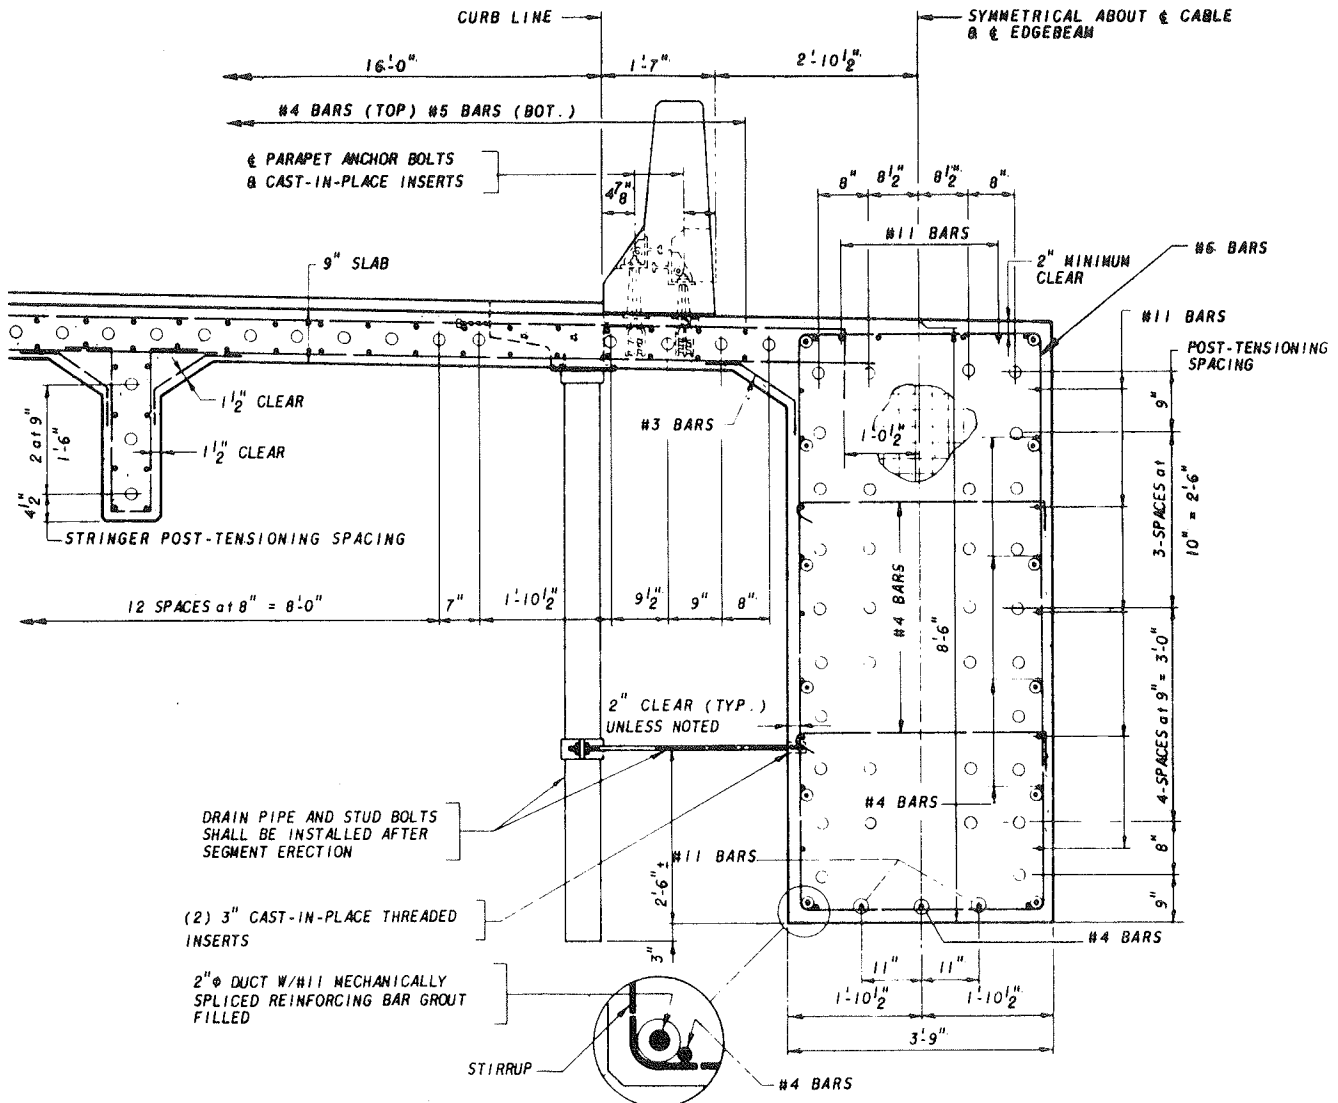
Concrete alternative: prestressing and reinforcing details.
